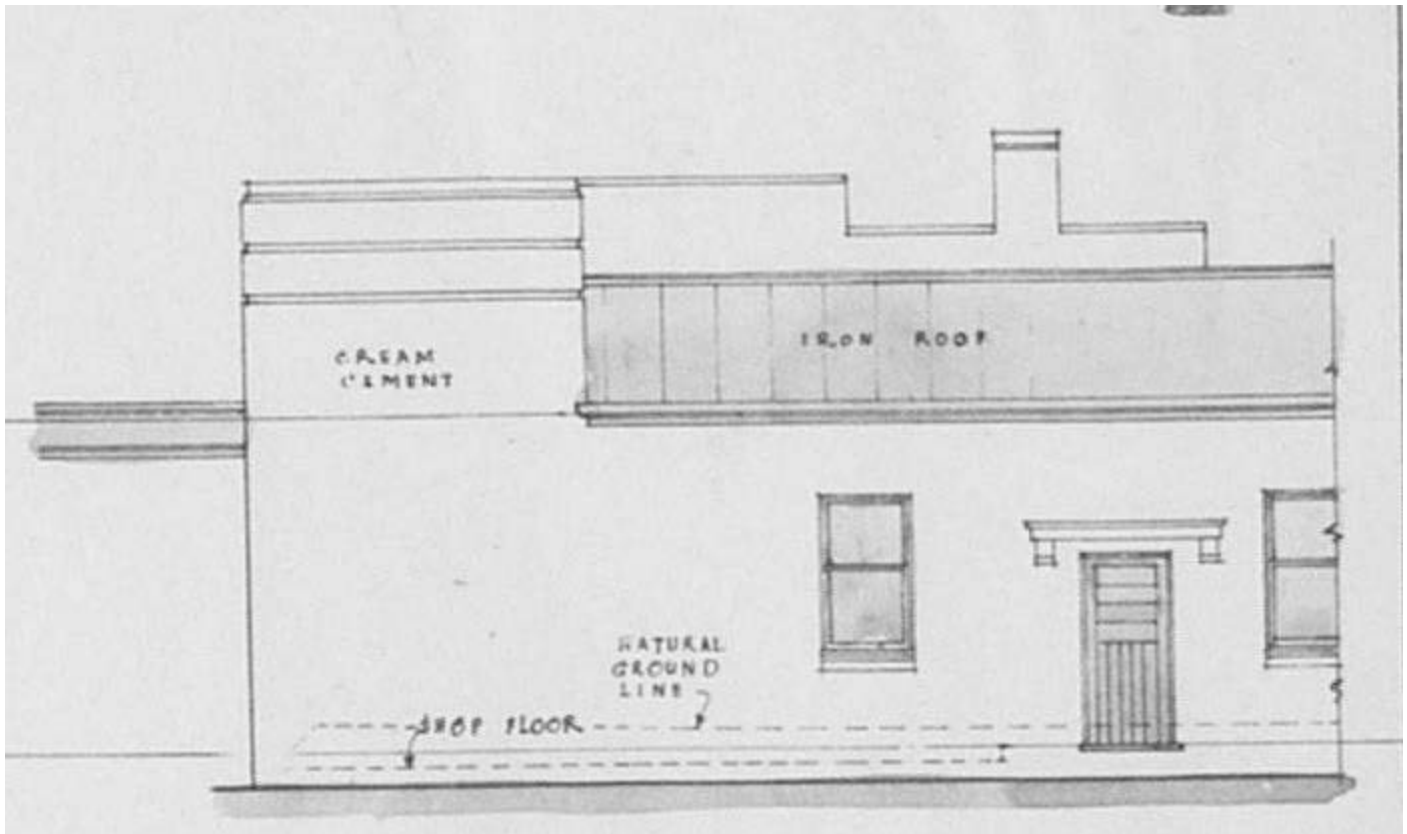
Original Plans for 553 Albany Highway, Victoria Park - Friendly Societies Building – part north elevation
